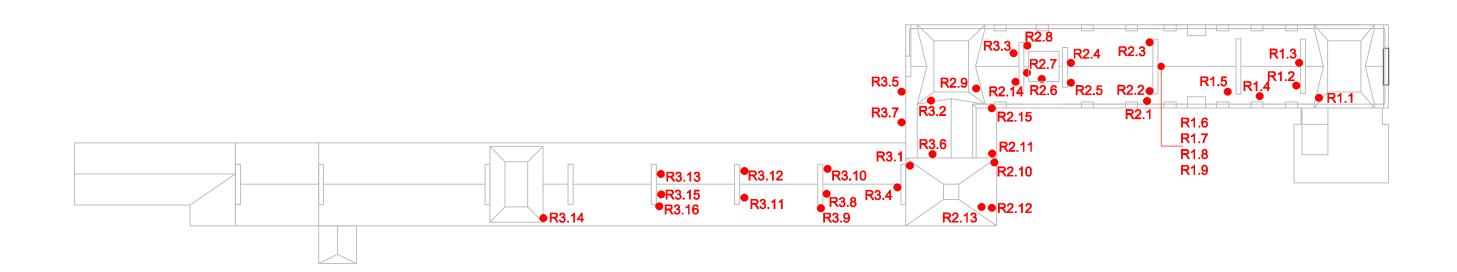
Plan R1/R2/R3 of Station Hotel Building showing Defect/Observation Locations
